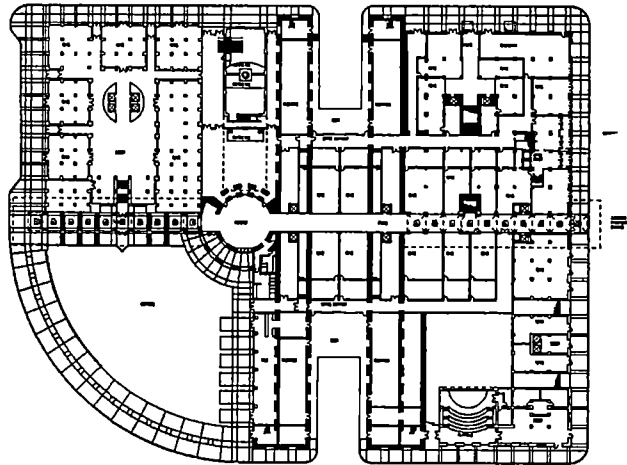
Proposed ground floor plan – Central Station, Memphis, Tennessee.
